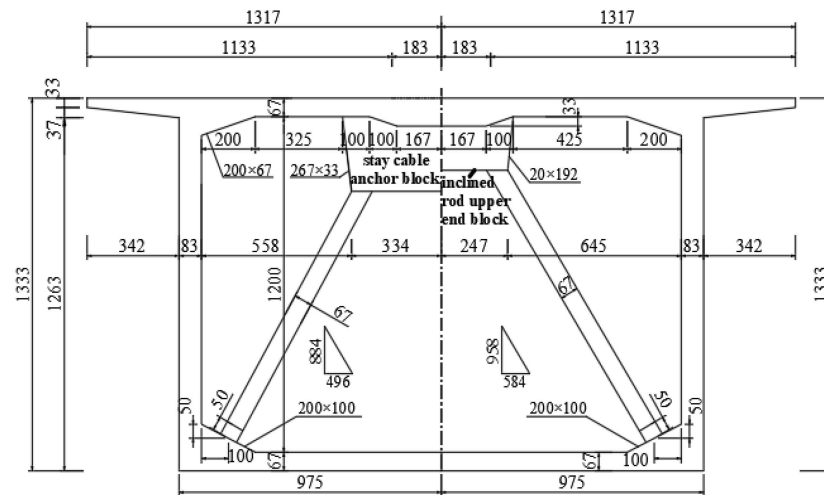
A-A section (left); B-B section (right) (unit: mm).
